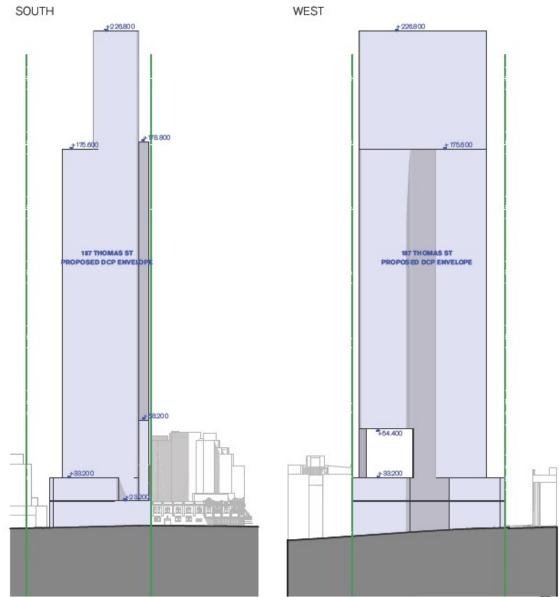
X South and West Envelope Elevations (Source: FJMT, March 2020)
